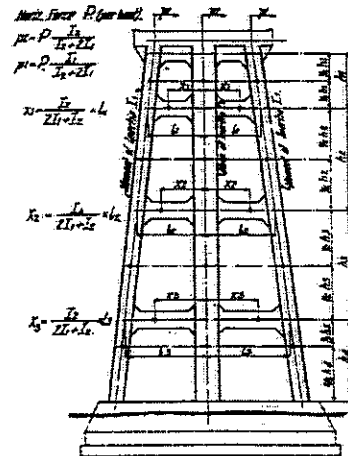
Bridges on North Toronto Subdivision, C.P.R. Dimensions of towers.
